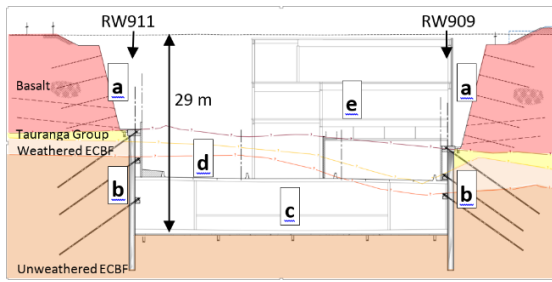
General arrangement of SAT, 20 m south of tunnel portal. a) Basalt cut, b) Anchored bored pile walls, c) Portal sump, d) Road deck, e) Southern Vent Building
